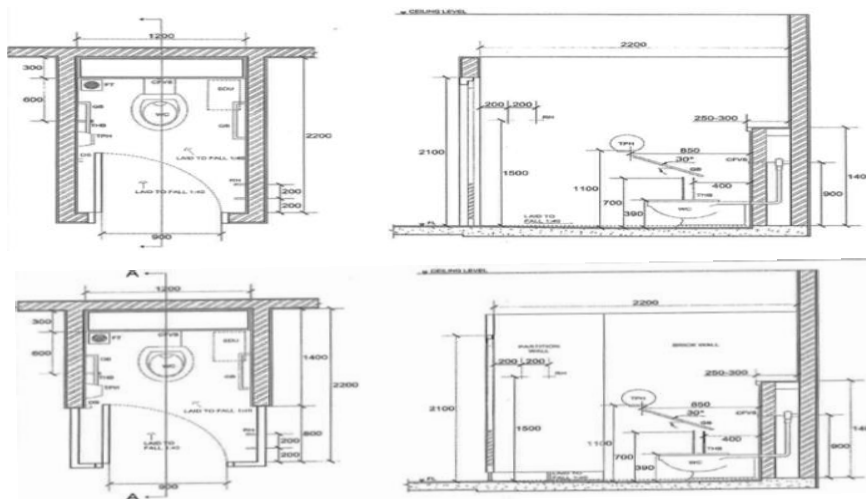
Full brick wall (top) and half brick wall and half partition cubicles plans (left) and sections (right)
